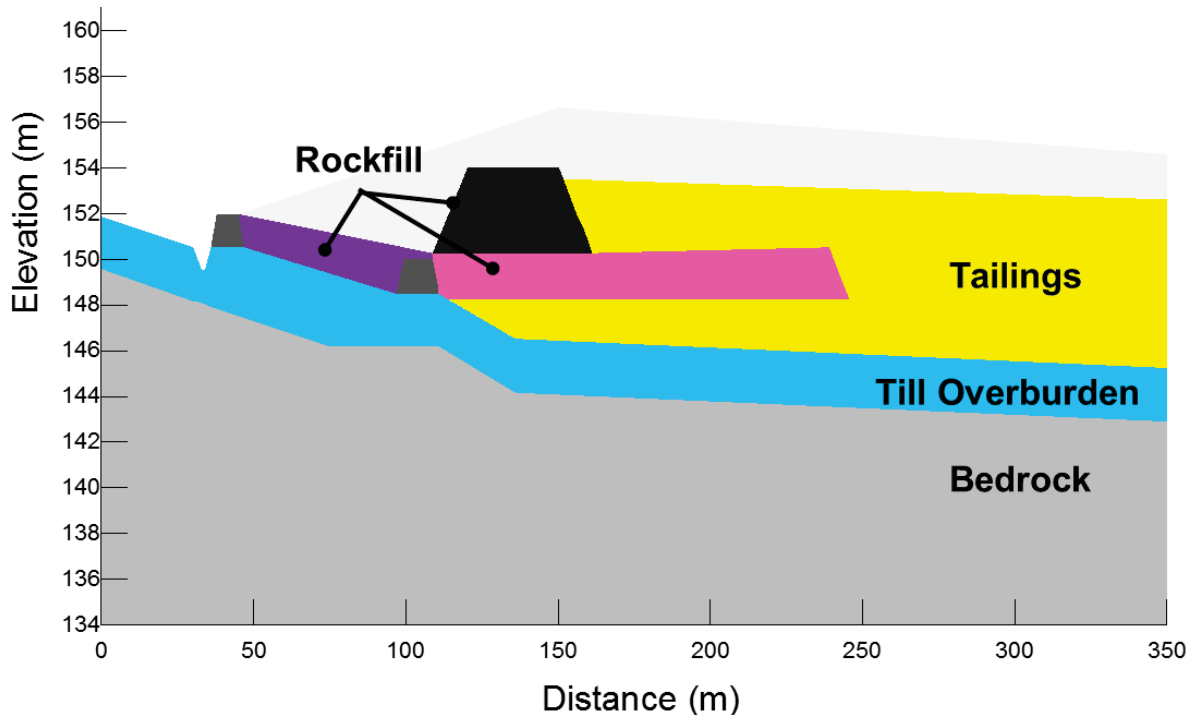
Typical cross section (Cross-Section 4) developed for slope stability analysis
